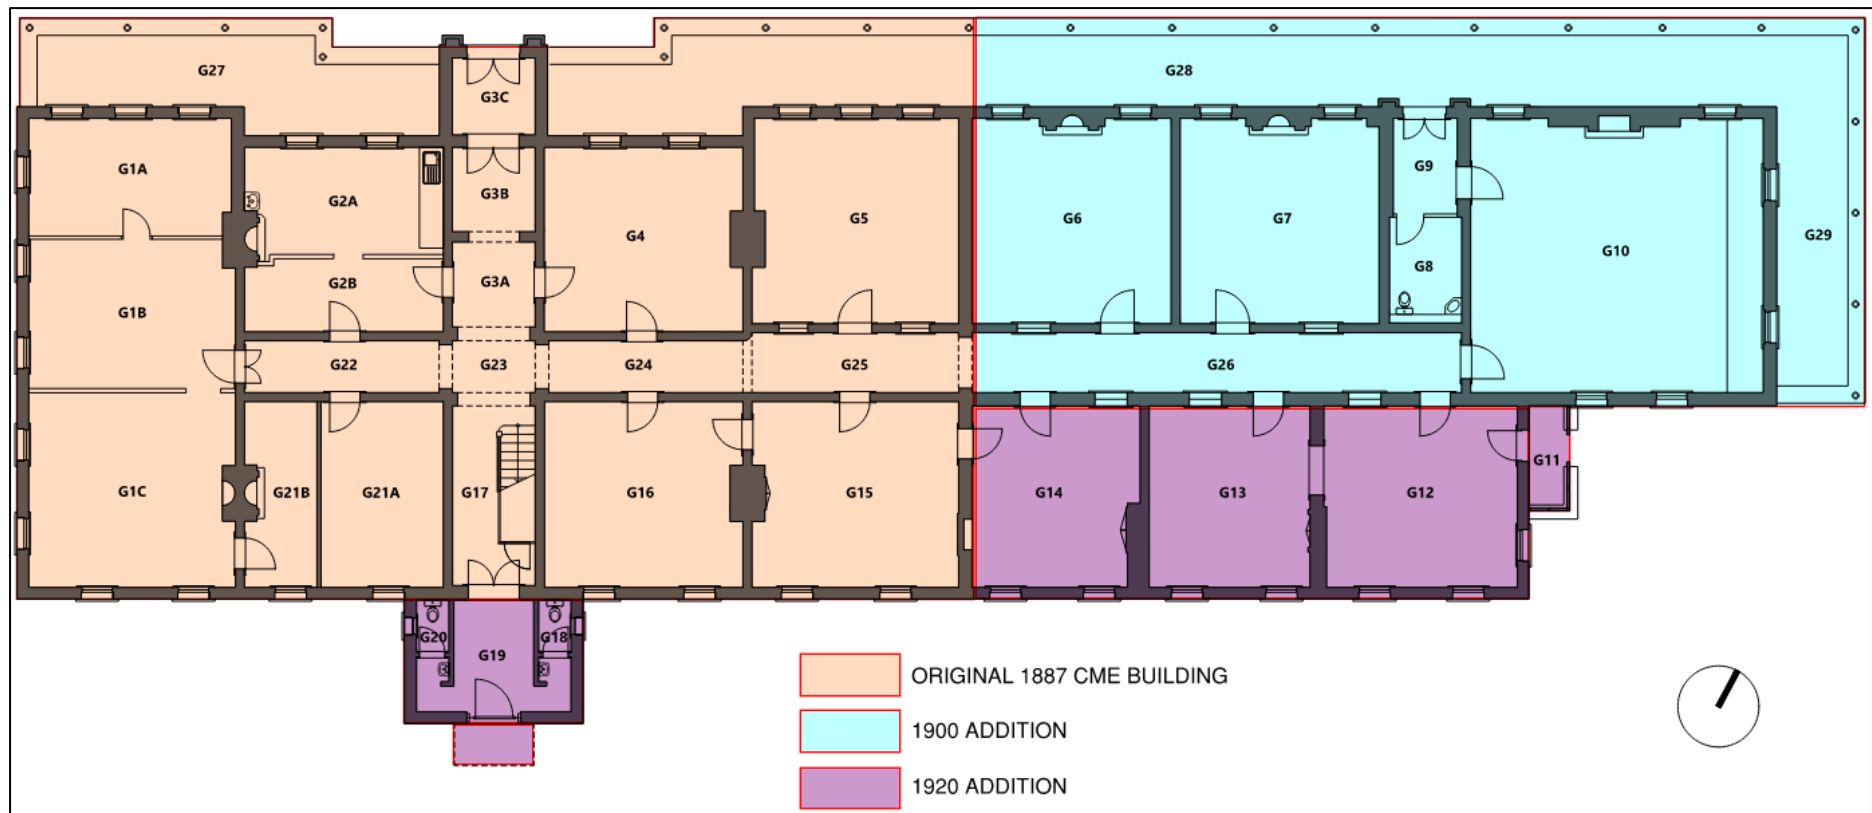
Ground Floor Layout showing Construction stages (Source: Curio Projects 2022)
